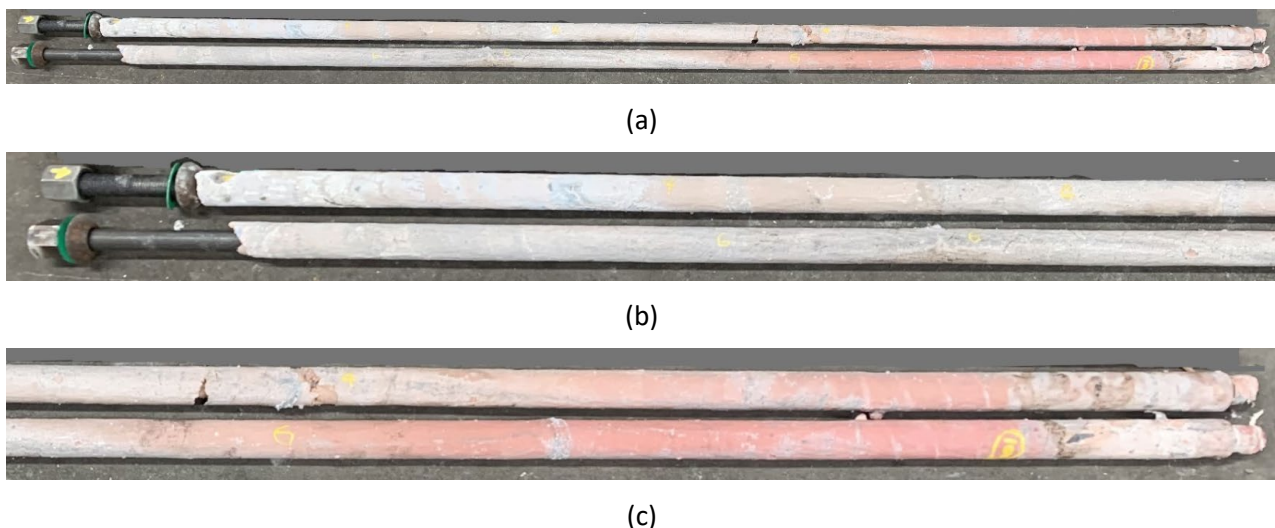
Two resin-encapsulated Versamix bolts. (a) View of full bolt lengths; (b) Corresponding view of lower bolt regions; (c) Corresponding view of upper bolt regions
